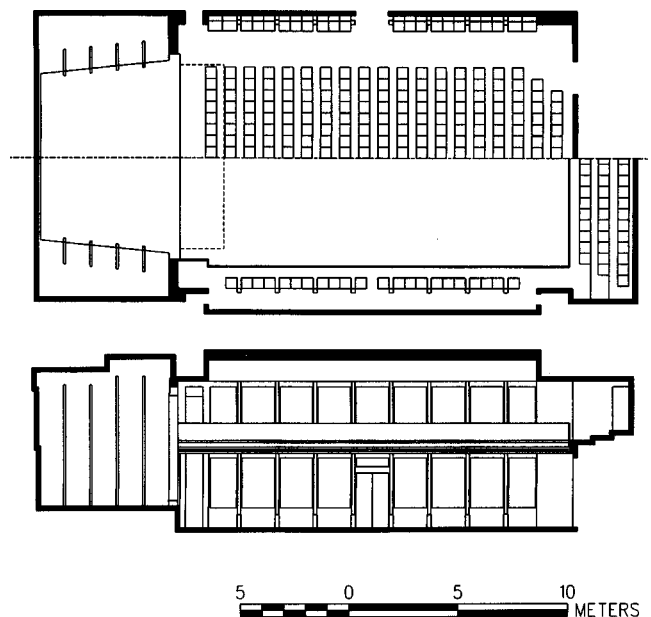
Berlin, Kleinersaal Konzerthaus, BK, plan and section.
